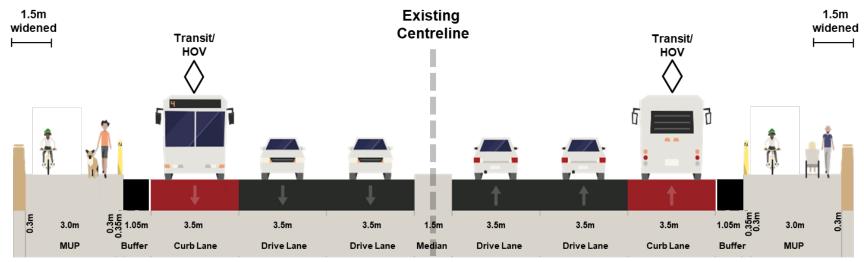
Alternative 4.2 - Structure Widened by Propped Cantilevers, 2 MUPs (No Road Shift)
